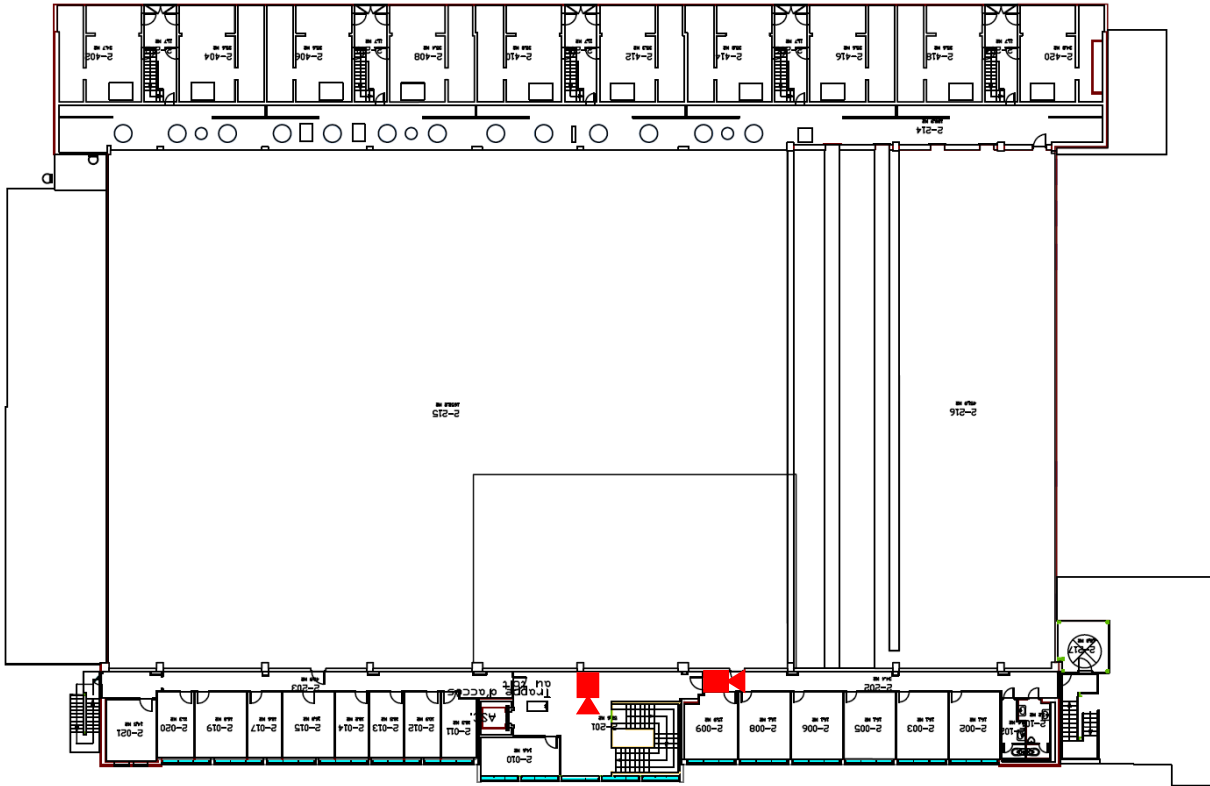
floor R+2 layout as well as the locations and orientations of cameras within this floor – building 2
